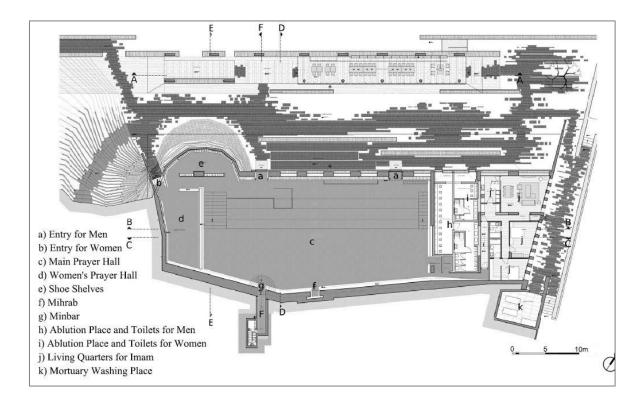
Sancaklar Mosque's ground floor plan (Adapted from ArchDaily, 2014)
